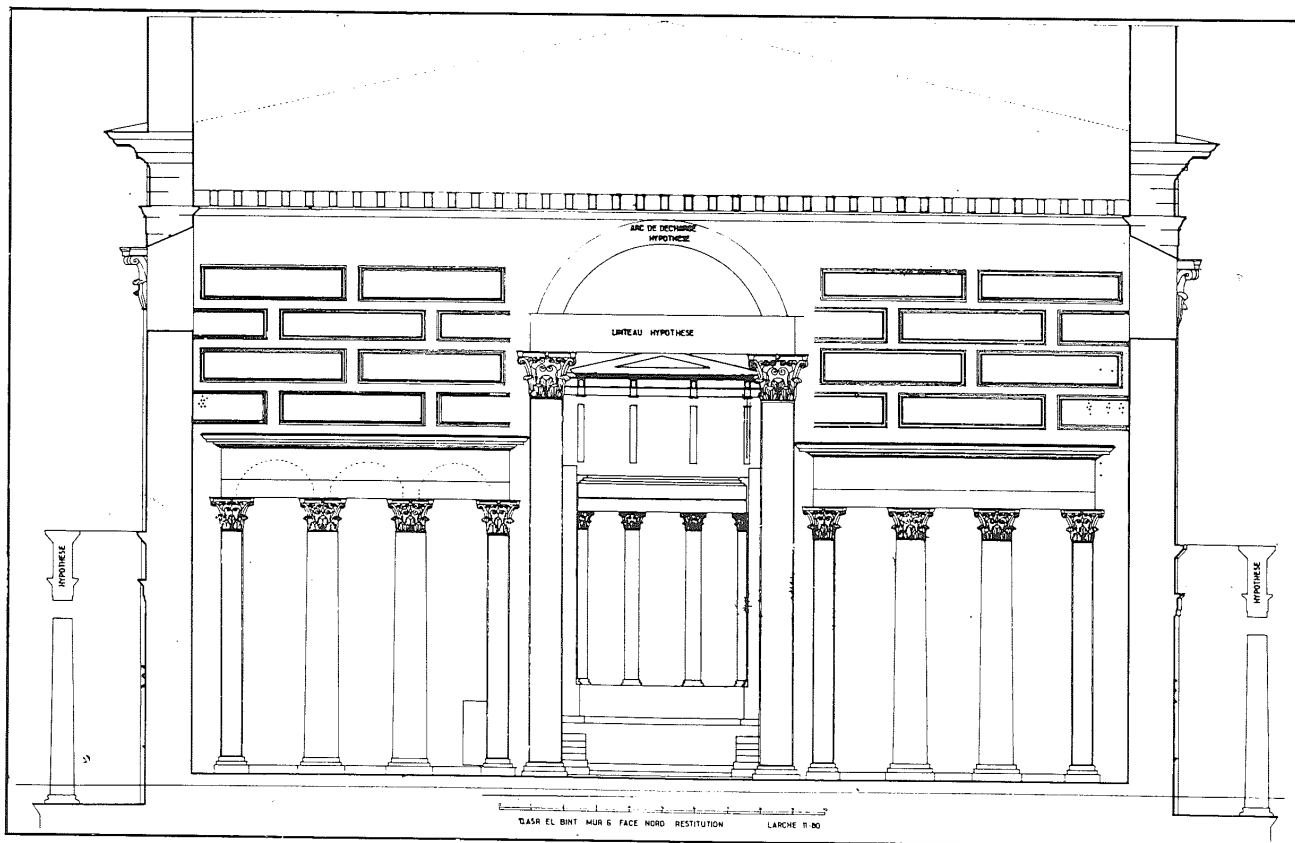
Reconstructed elevation of the N. facade of the triabsidal *cella* (after F. Larché).
